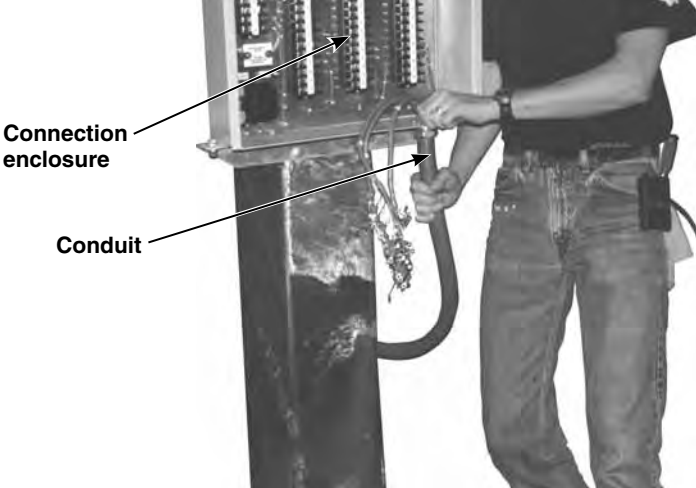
Attach the conduit for pole-unit wiring to the punched hole on the enclosure bottom.
